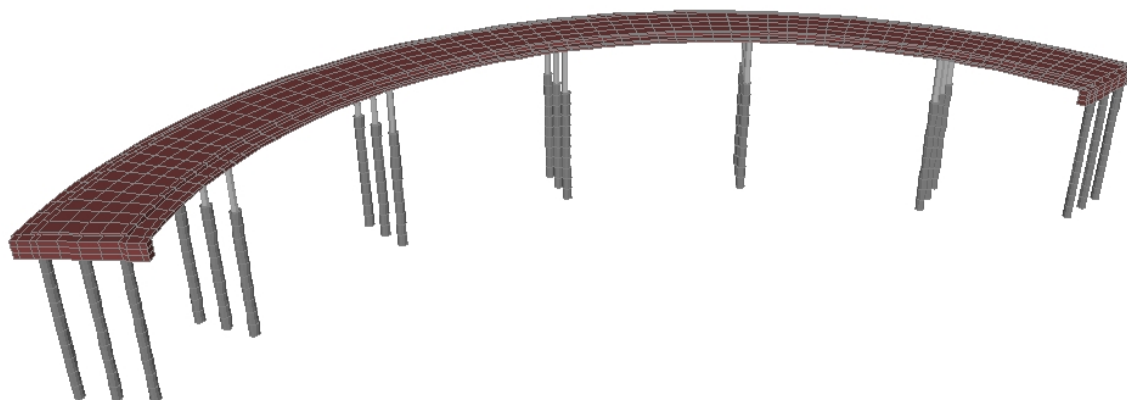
A Typical Finite Element Model of the Studied Bridges
